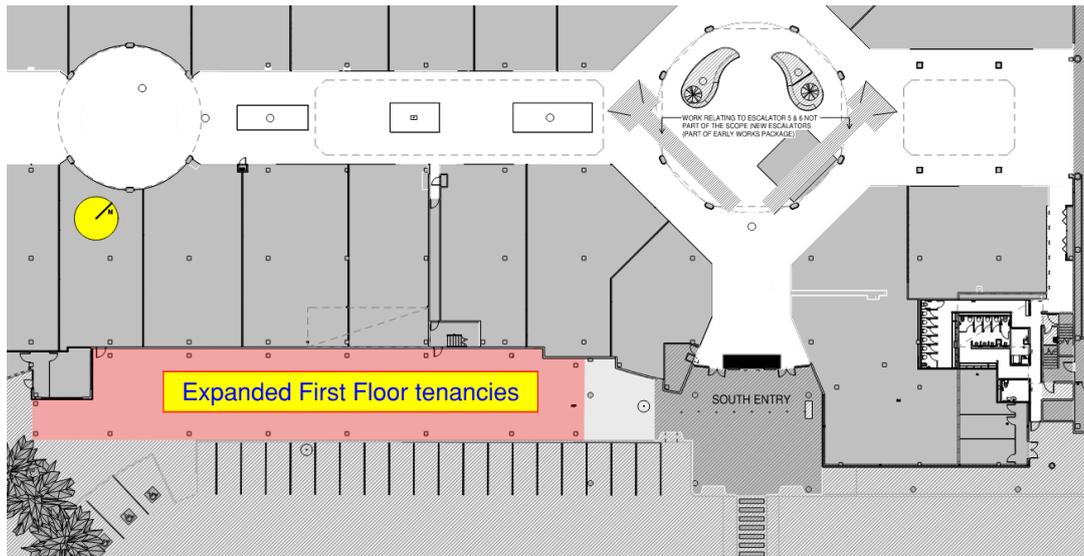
Omission of sprinkler protection below new extended tenancies on First Floor
